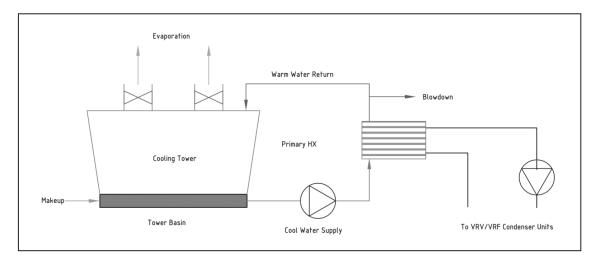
Typical Arrangement of Air Conditioning System and Cooling Tower
